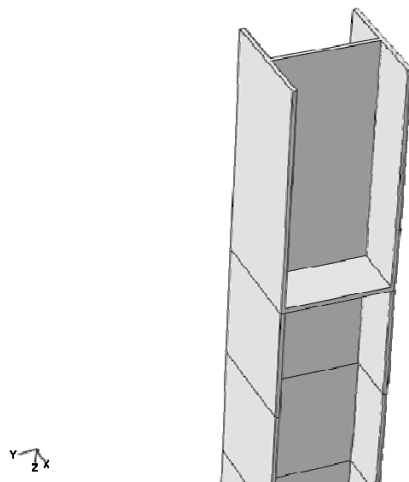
Stiffened Pile at the Wall Lower Face Section
